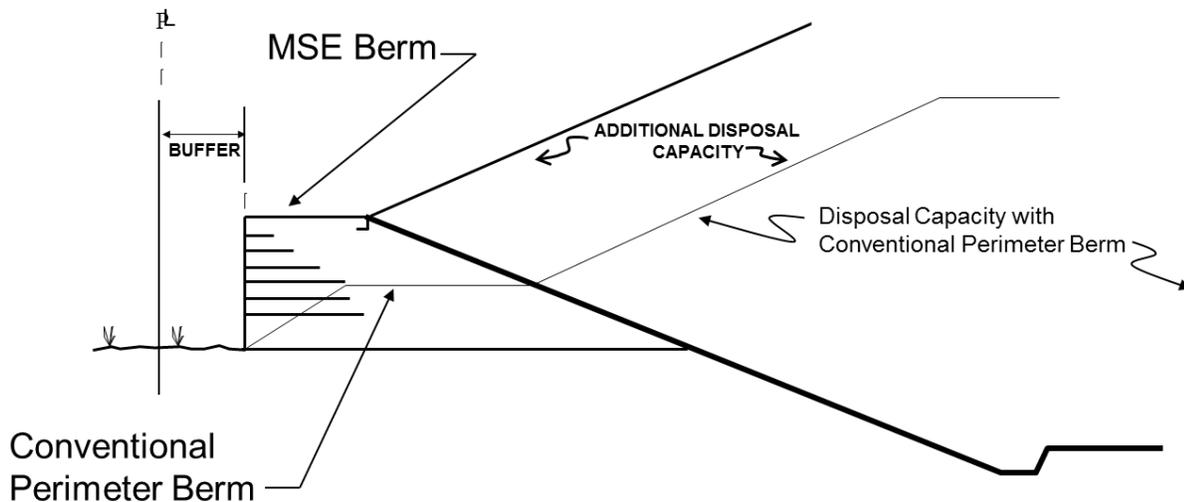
Cross section showing additional disposal capacity provided by Mechanically Stabilized Earth perimeter berm.
